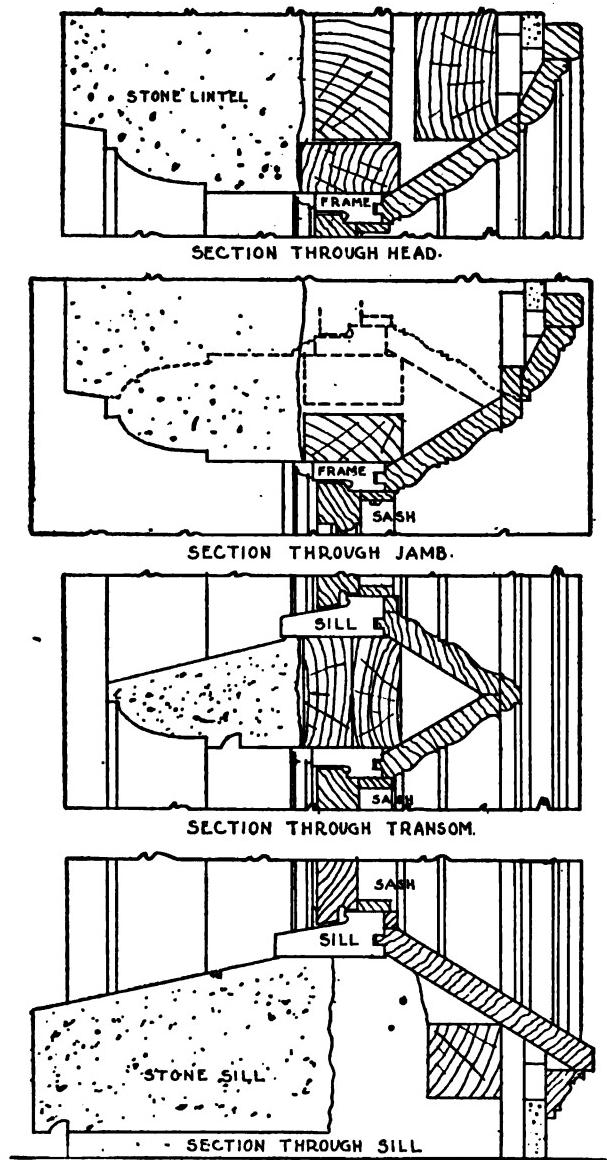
Casement-Window in Masonry Wall, Sashes Opening Out.
